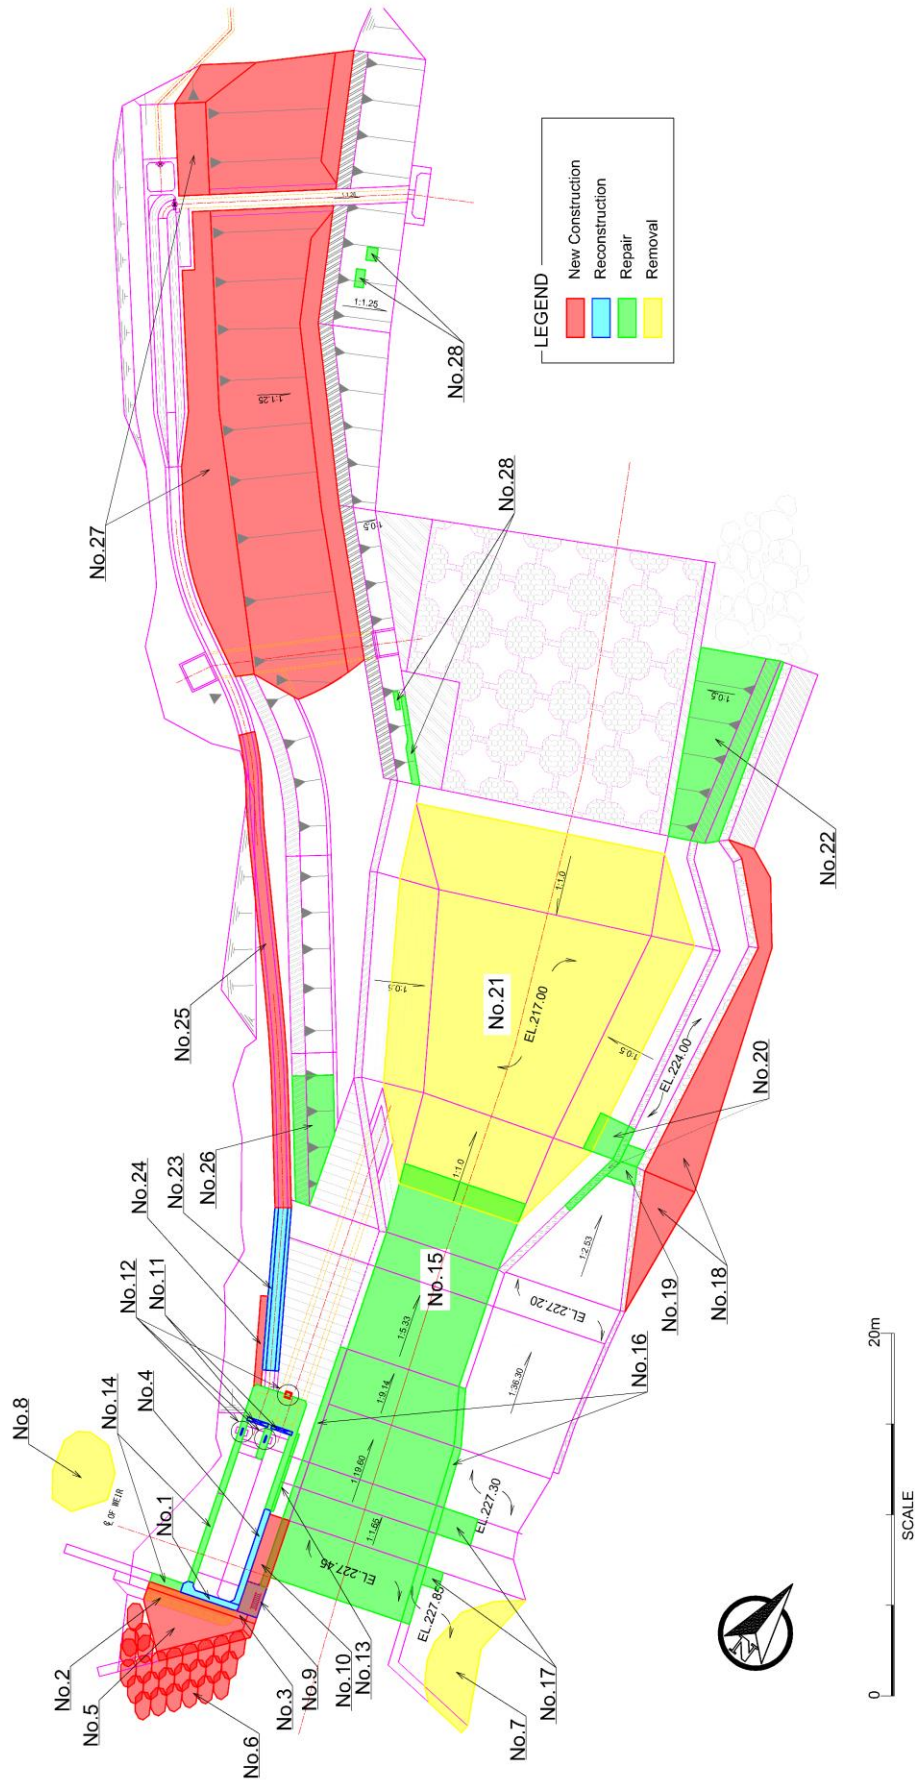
Rehabilitation Plan for the Bemós Water Supply system
